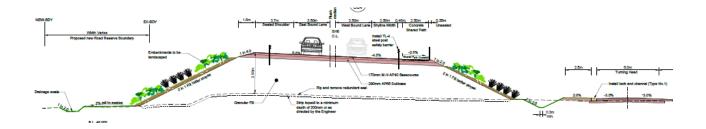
Cross Section - Rongahere Rd / SH8 Intersection
